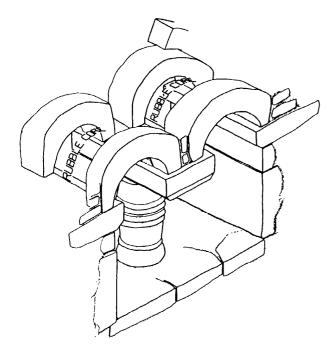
Barton-upon-Humber: isometric drawing of one of the gallery windows in the tower, showing semicircular stone facings to a rubble vault erected on timber centring (drawn by Steve Coll)
